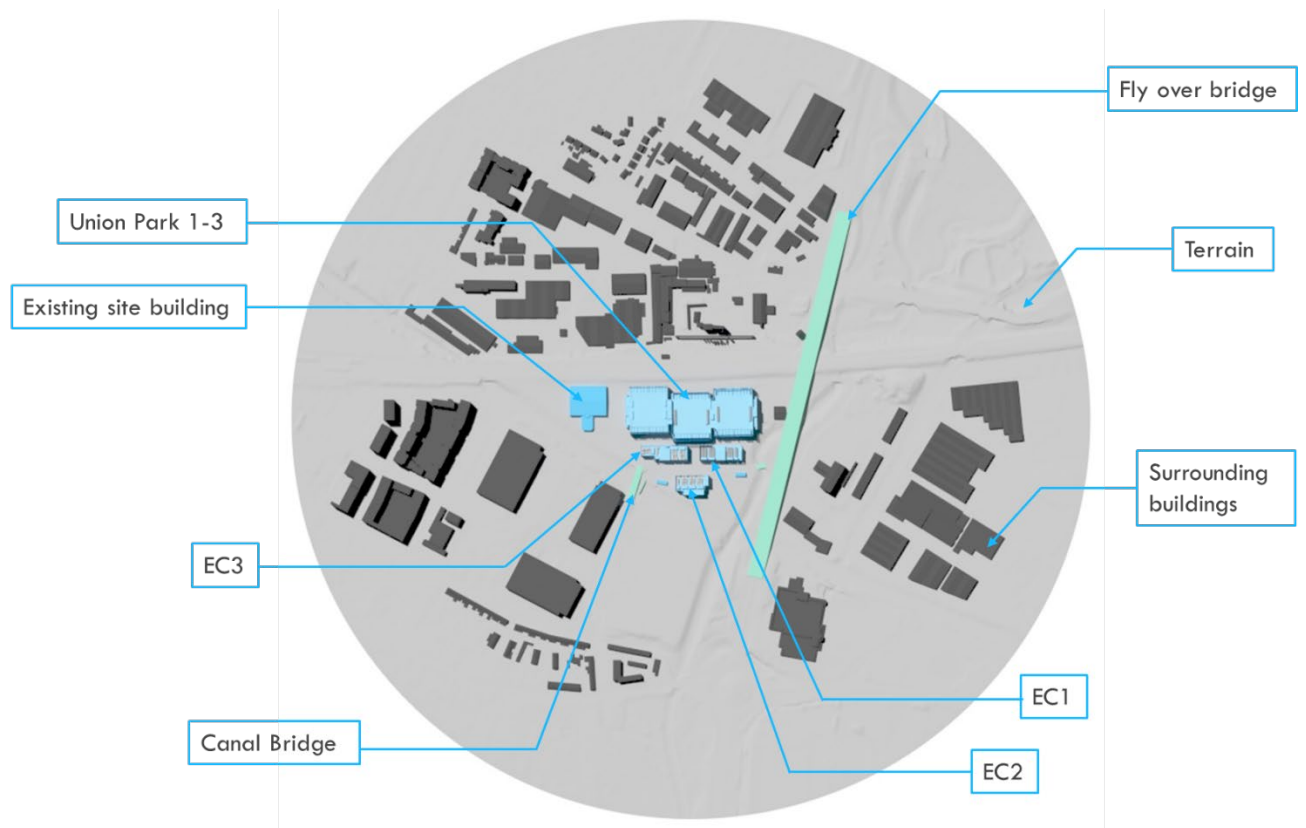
Plan view of the modelled existing site and surrounding buildings.
